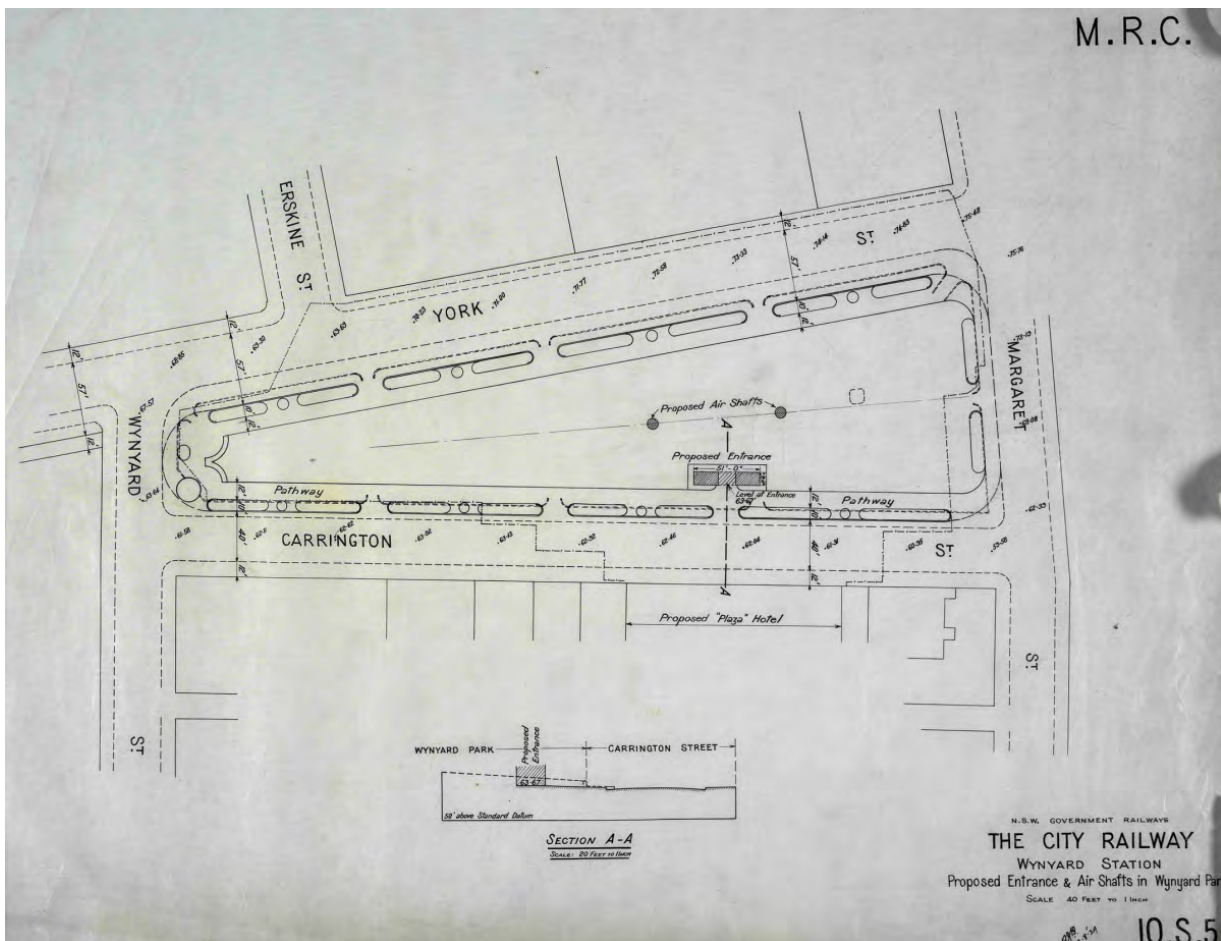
1929 plan of the proposed entrance for Wynyard Station fronting Carrington Street. This entry was not built at the time of the initial station development, and by 1940 the area had been landscaped as part of the park. However, the site was reserved for future use, if required. The plan also shows the location of a proposed hotel (Plaza Hotel) on Carrington Street. (Source: State Records R121 10.S.5)
